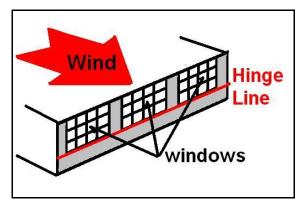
Illustration of how unreinforced masonry walls failed on schools. Walls rotated about hinge lines at the bases of the windows.
